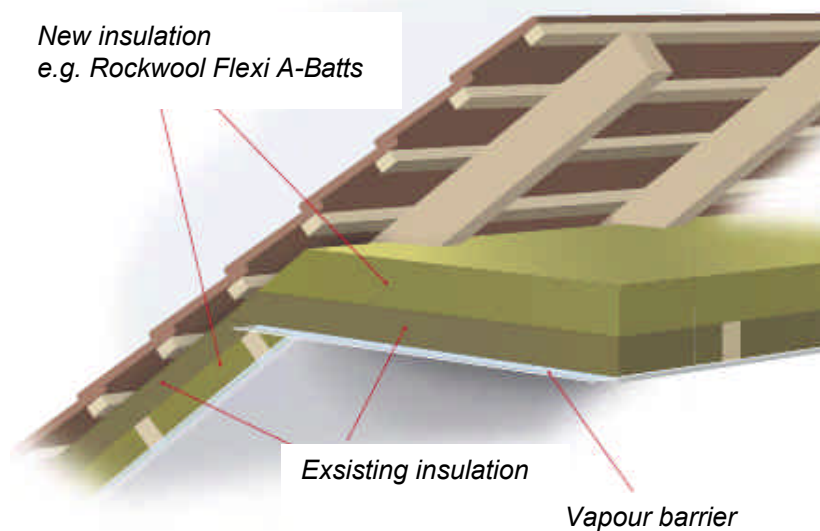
Energy renovation of sloping walls under the roof.
